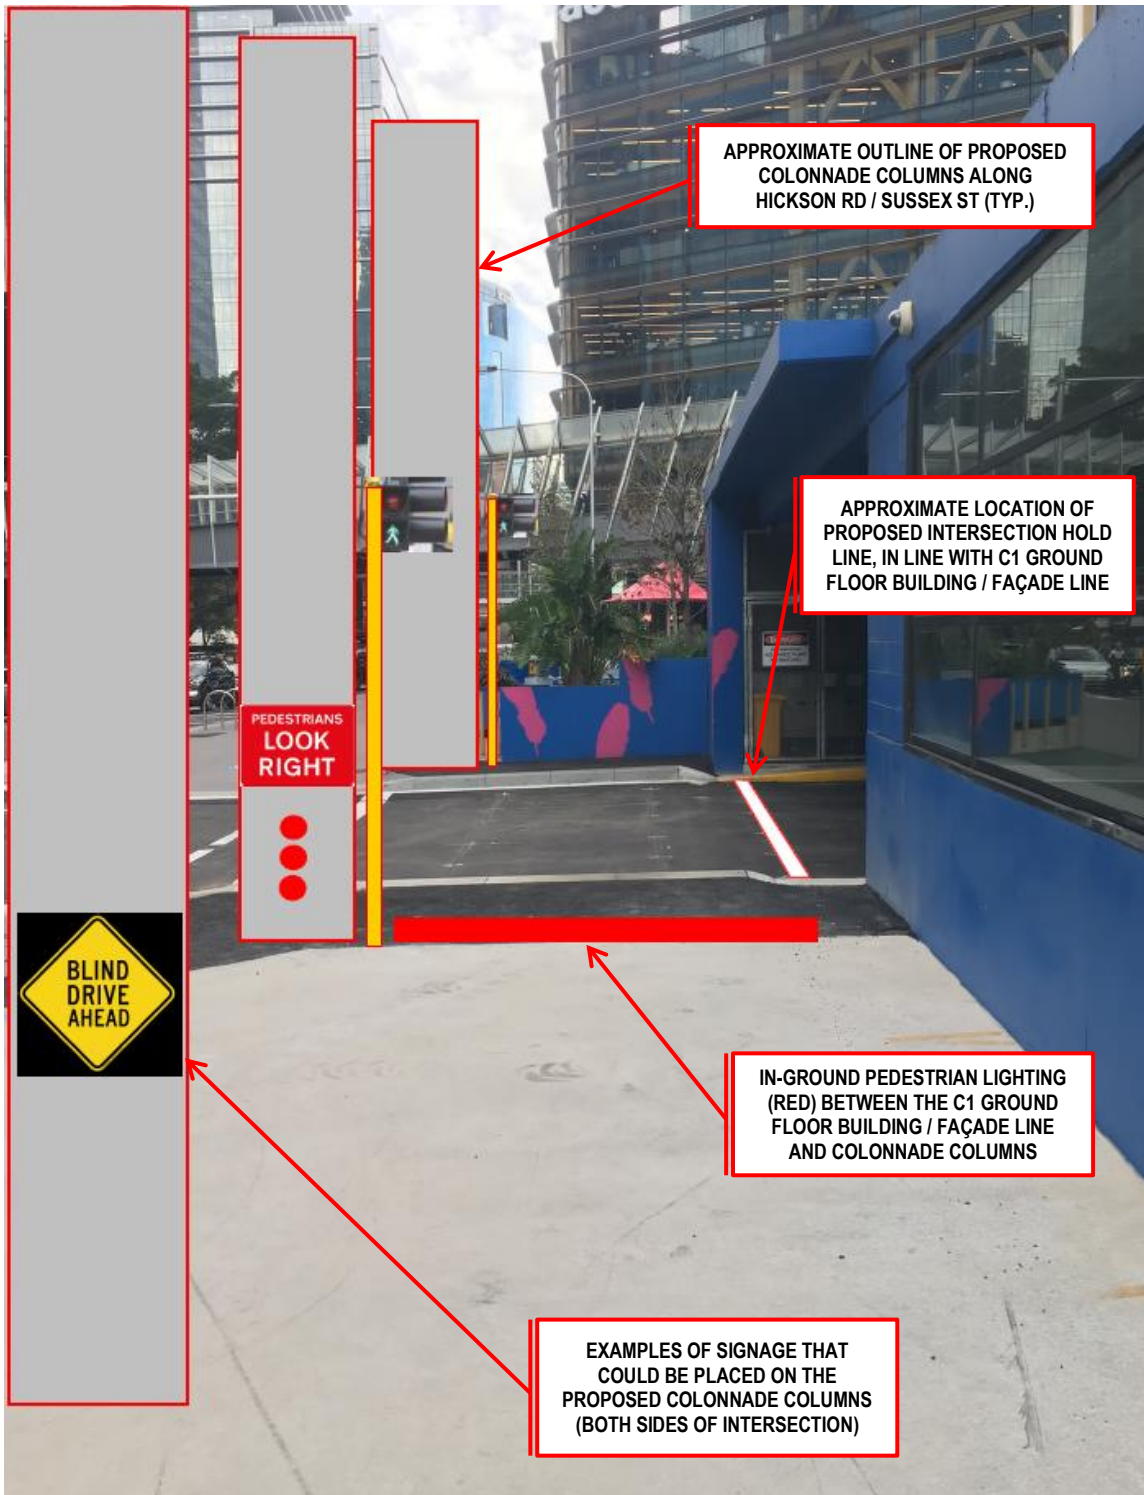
View of future footpath under proposed colonnade (facing south)
